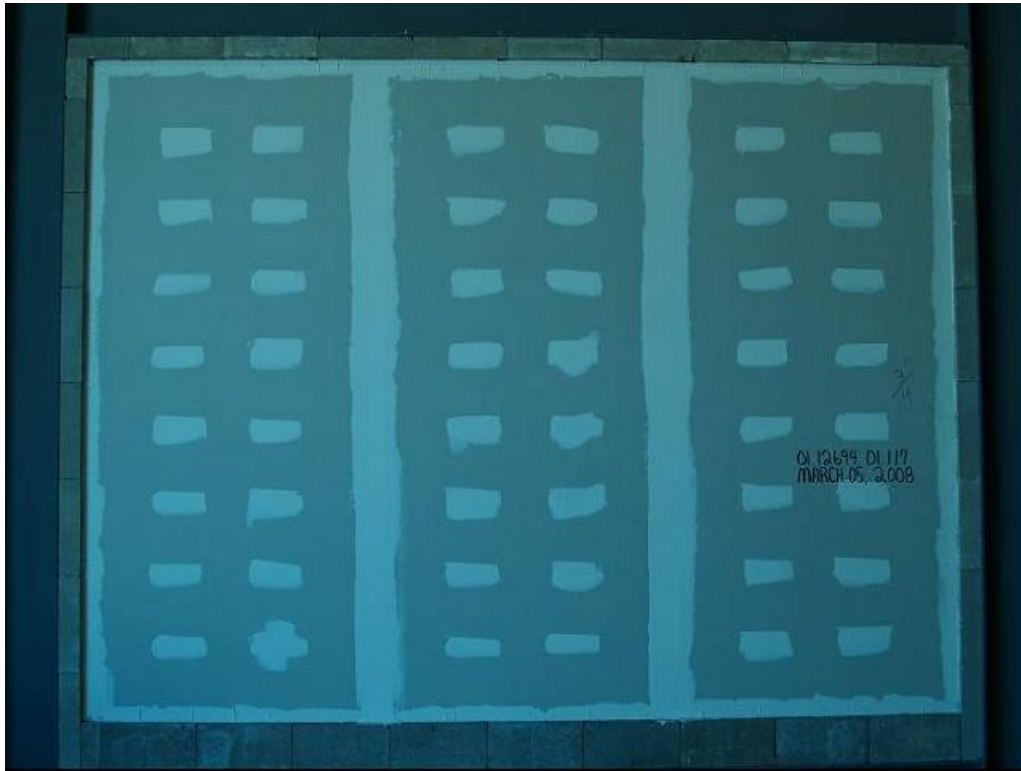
Exposed Face of Fire Test Wall prior to Furnace Exposure.
